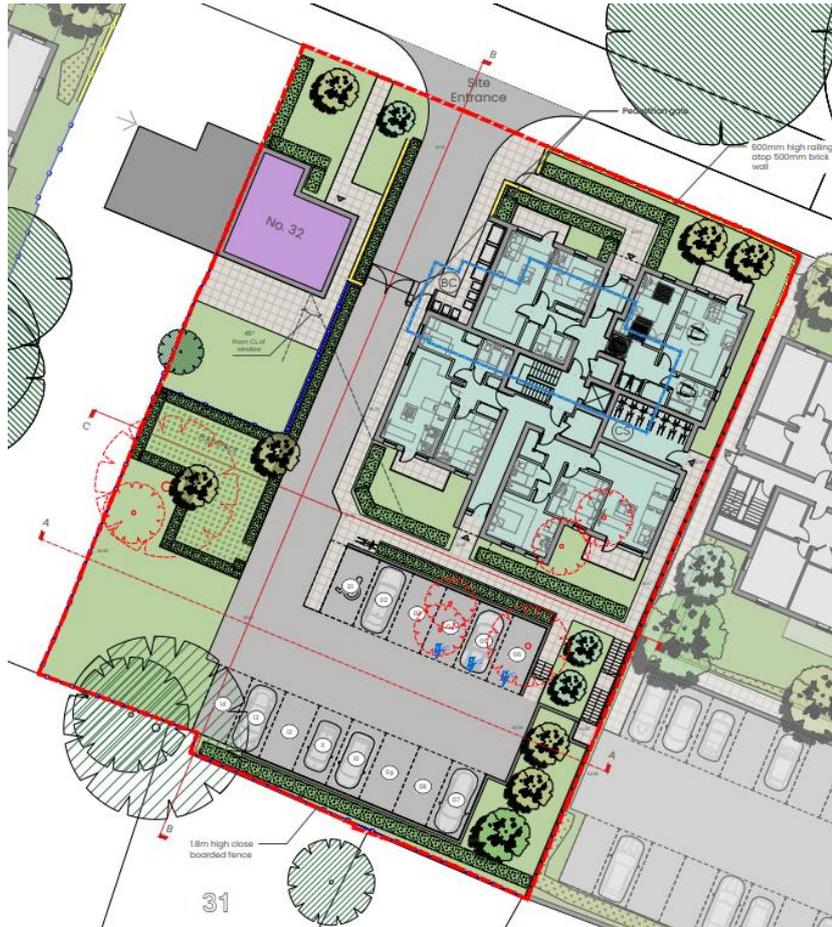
Proposed site layout and 45 degree line (NEED CHANGE)
